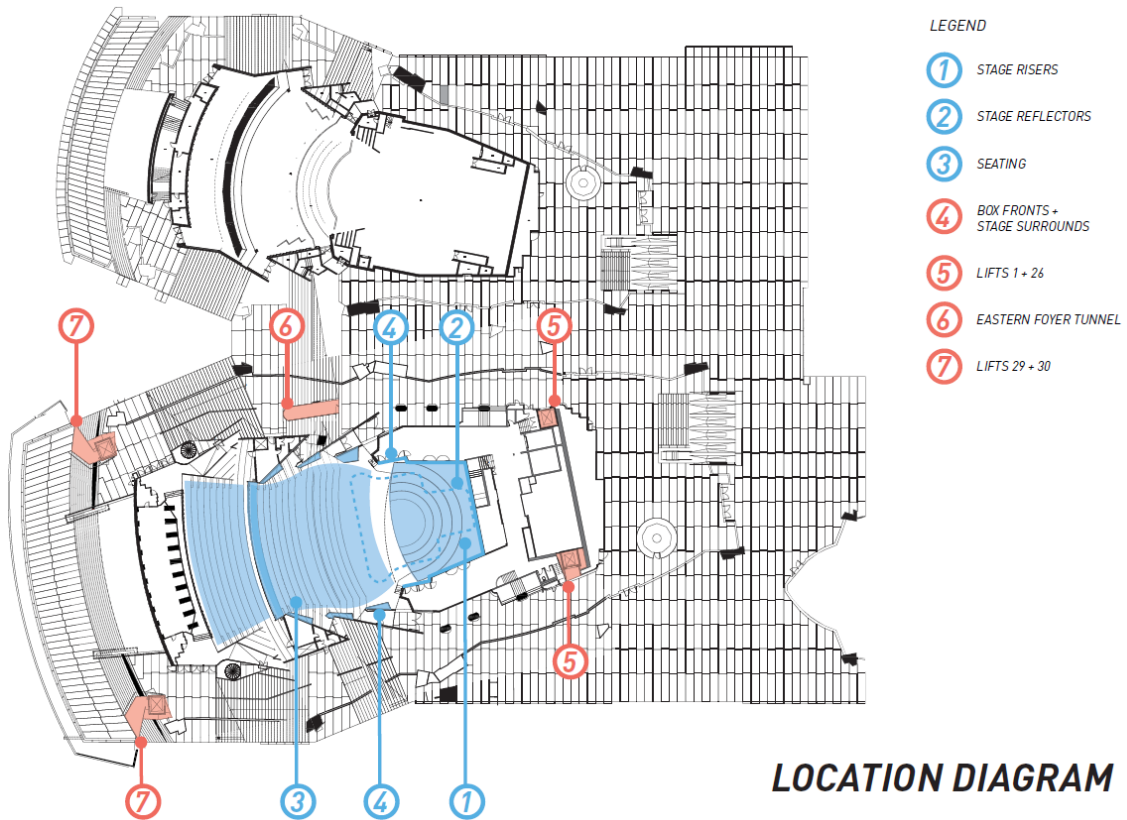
Indicative upgrades to Concert Hall (Source: ARM Architecture)
